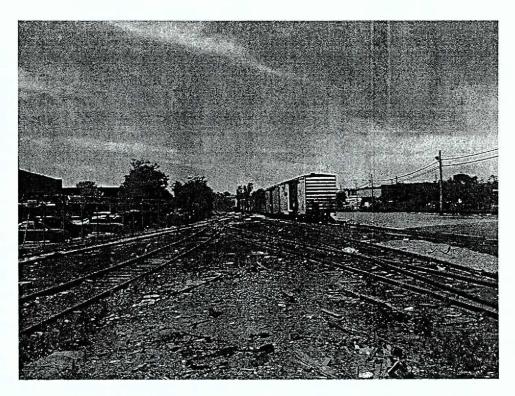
The Long Island Railroad grade crossing at Maspeth Avenue; view to the northwest.
